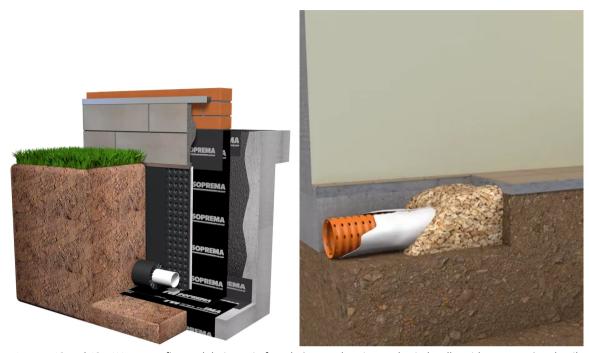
, 10 and 11 – Details of the start of the ETICS system façade
